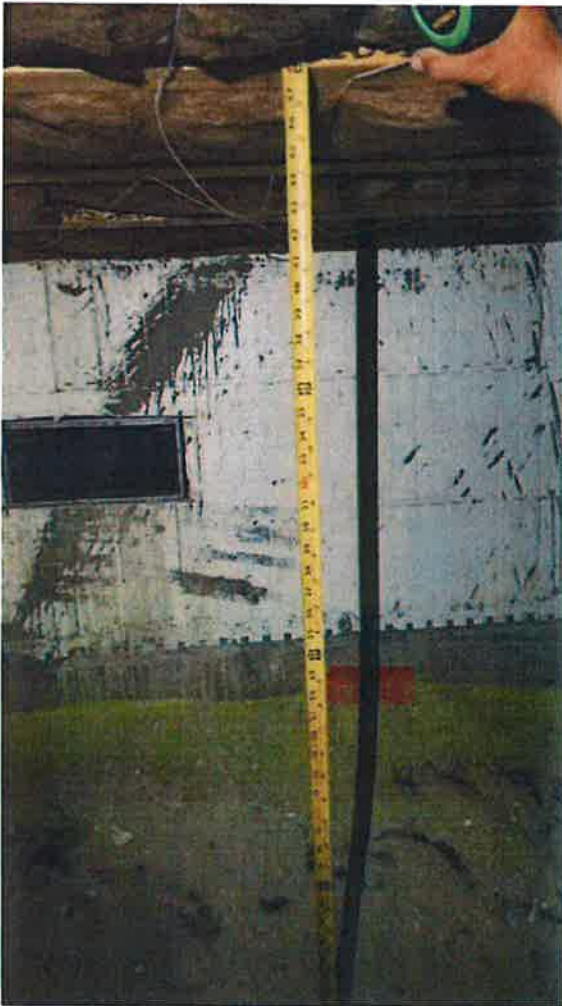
Photo Four Caption 2018-01-16: C2.E. AT BOTTOM OF WATER HEATER (LOCATED ON GARAGE FLOOR)
